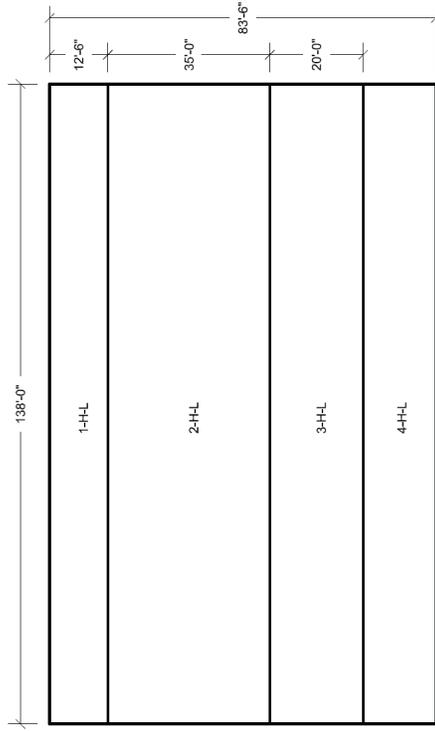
H.6-9Z: LHS BASIN EAST WALL LOOKING WEST
